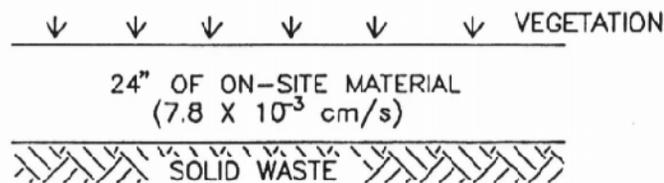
ALTERNATIVE CAP 1: ON-SITE MATERIAL
